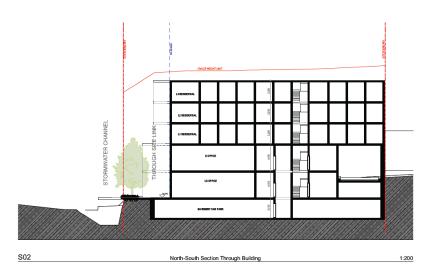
North-South Section through the building indicating 6m setback from the creek and 17m (5 storey) height limit
